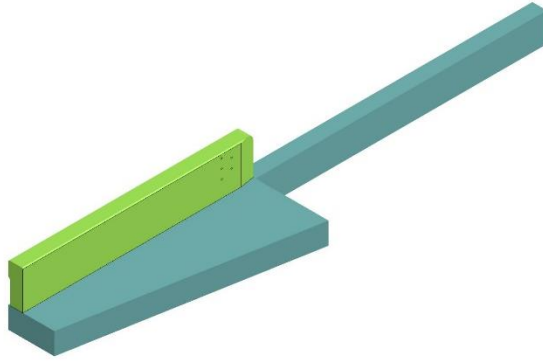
Parapet, Moment Slab, and Wingwall.
